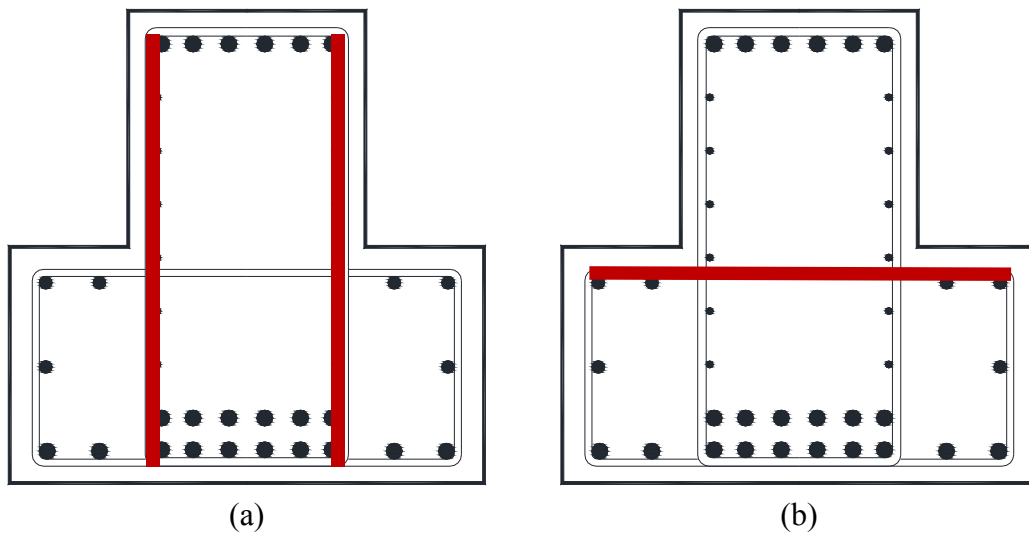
Cross-section showing (a) hanger and (b) ledge reinforcement
